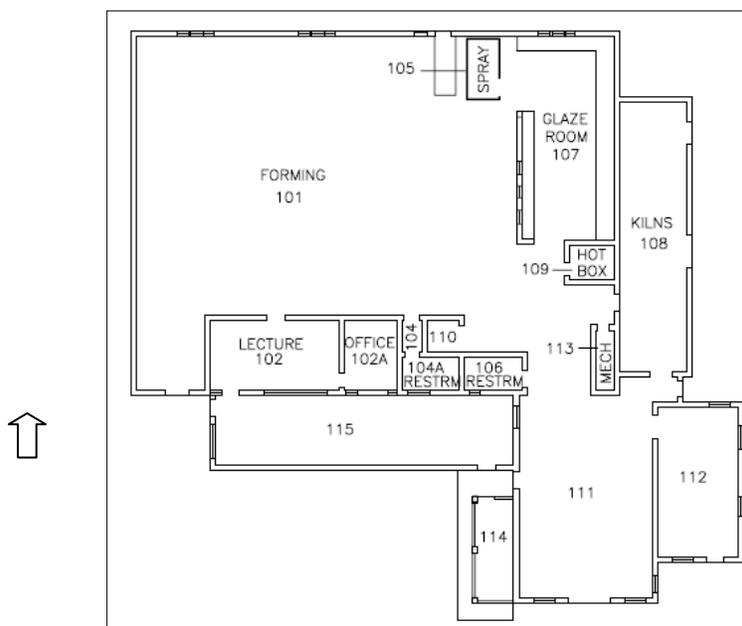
Floor plan of the Ceramics Lab.¹²
